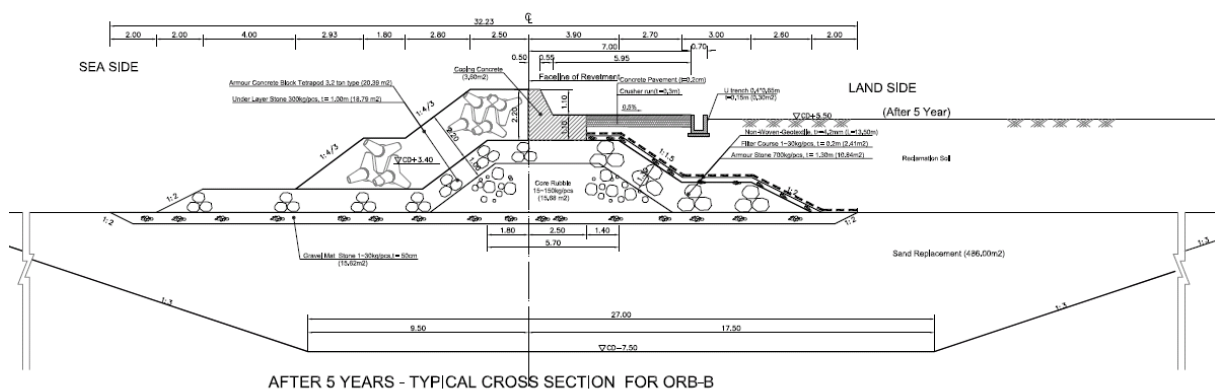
Typical Cross Section for Outer Revetment B with Sand Replacement
